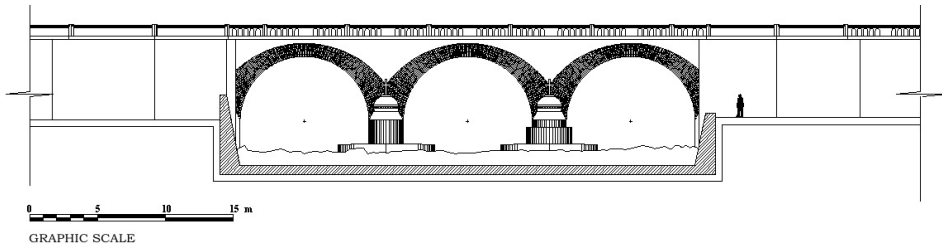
Rendering of the central portion of the La Libertad Bridge.
